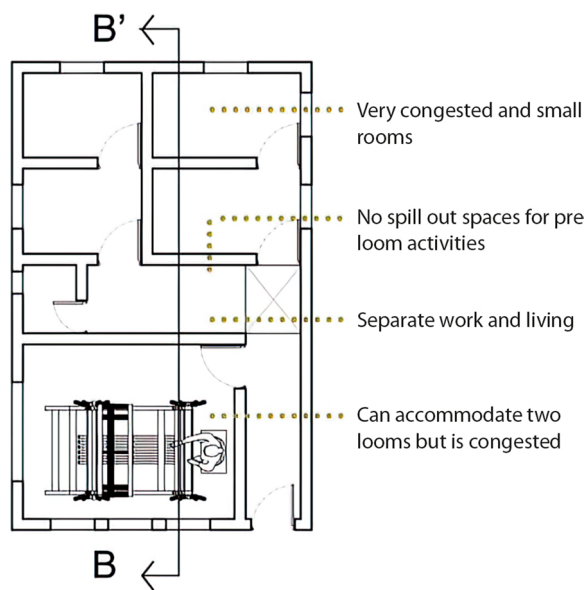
Floor plan of single-family dwelling and its spatial characteristics (Source: the author)
